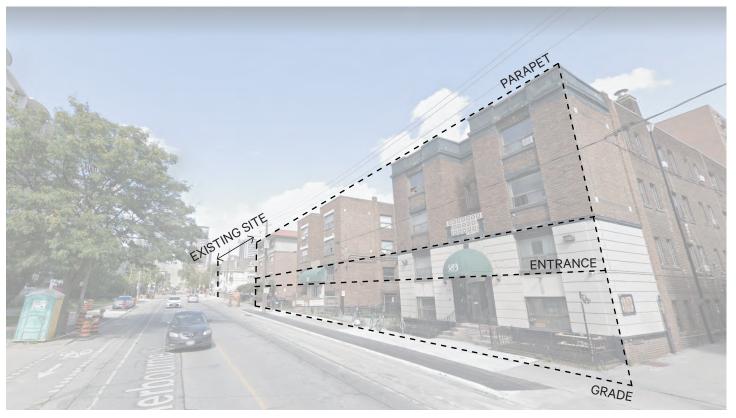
Sherbourne Street Elevation Vertical Datum Lines
